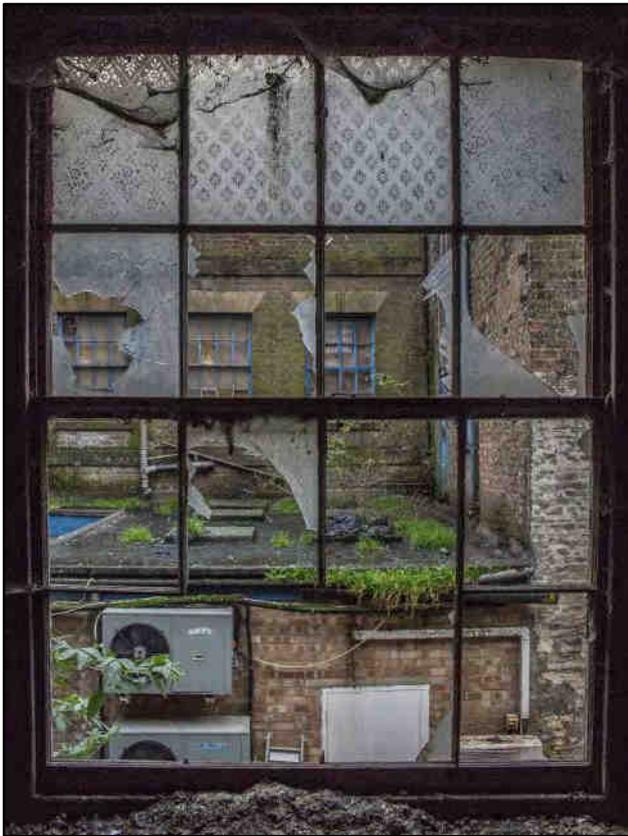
Vertical sliding sash window with frosted and etched glass pane, F3
